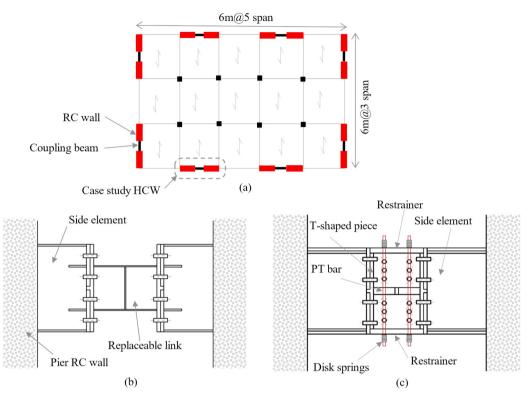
(a) Plan of the archetype building; (b) R-HCW coupling beams; (c) SC-HCW coupling beams.
